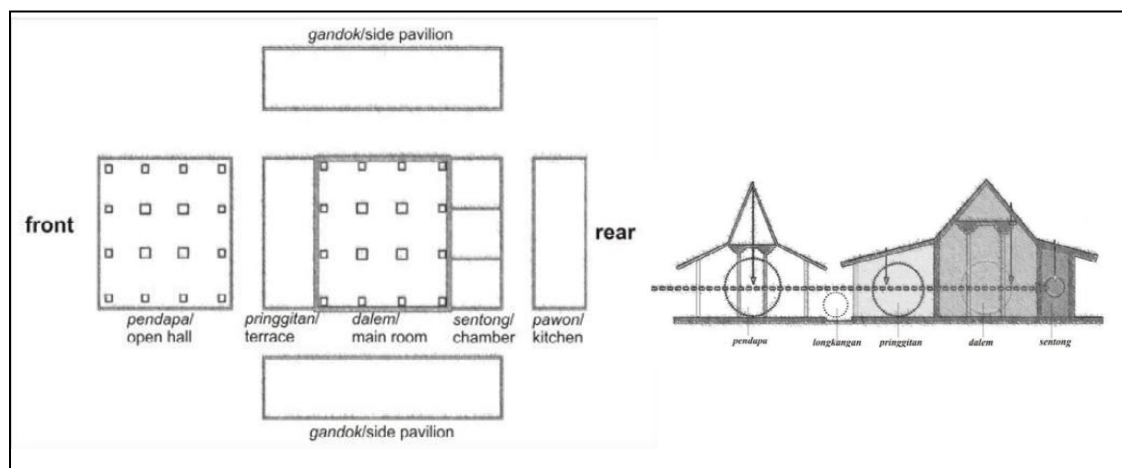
The arrangement of spaces in Javanese House and The schematic section of Javanese house
